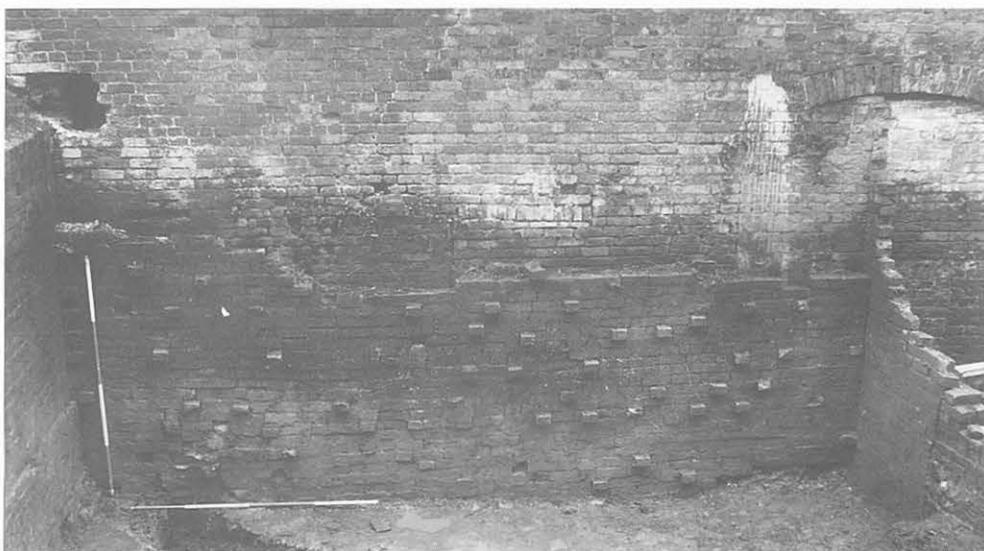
The skin wall exposed against the central range east wall inside wheelpit 1, photographed in 1994 during excavations. The skin wall was demolished after it was recorded to allow repairs to the central range wall.
